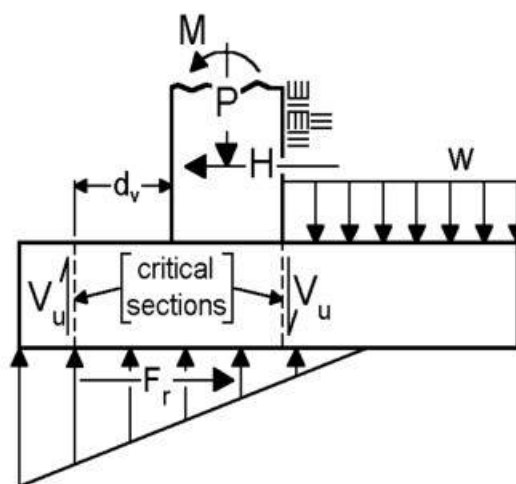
Example of Critical Section for Shear in Footings
